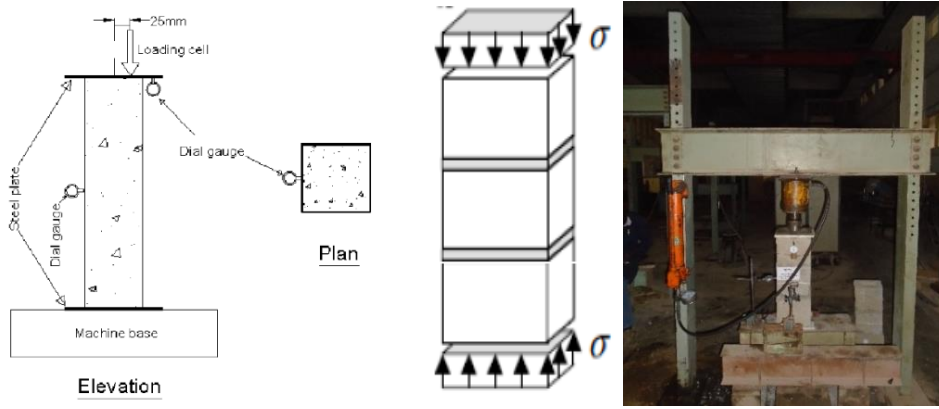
Schematic Description and Picture of Masonry Prism Column Test Set up
